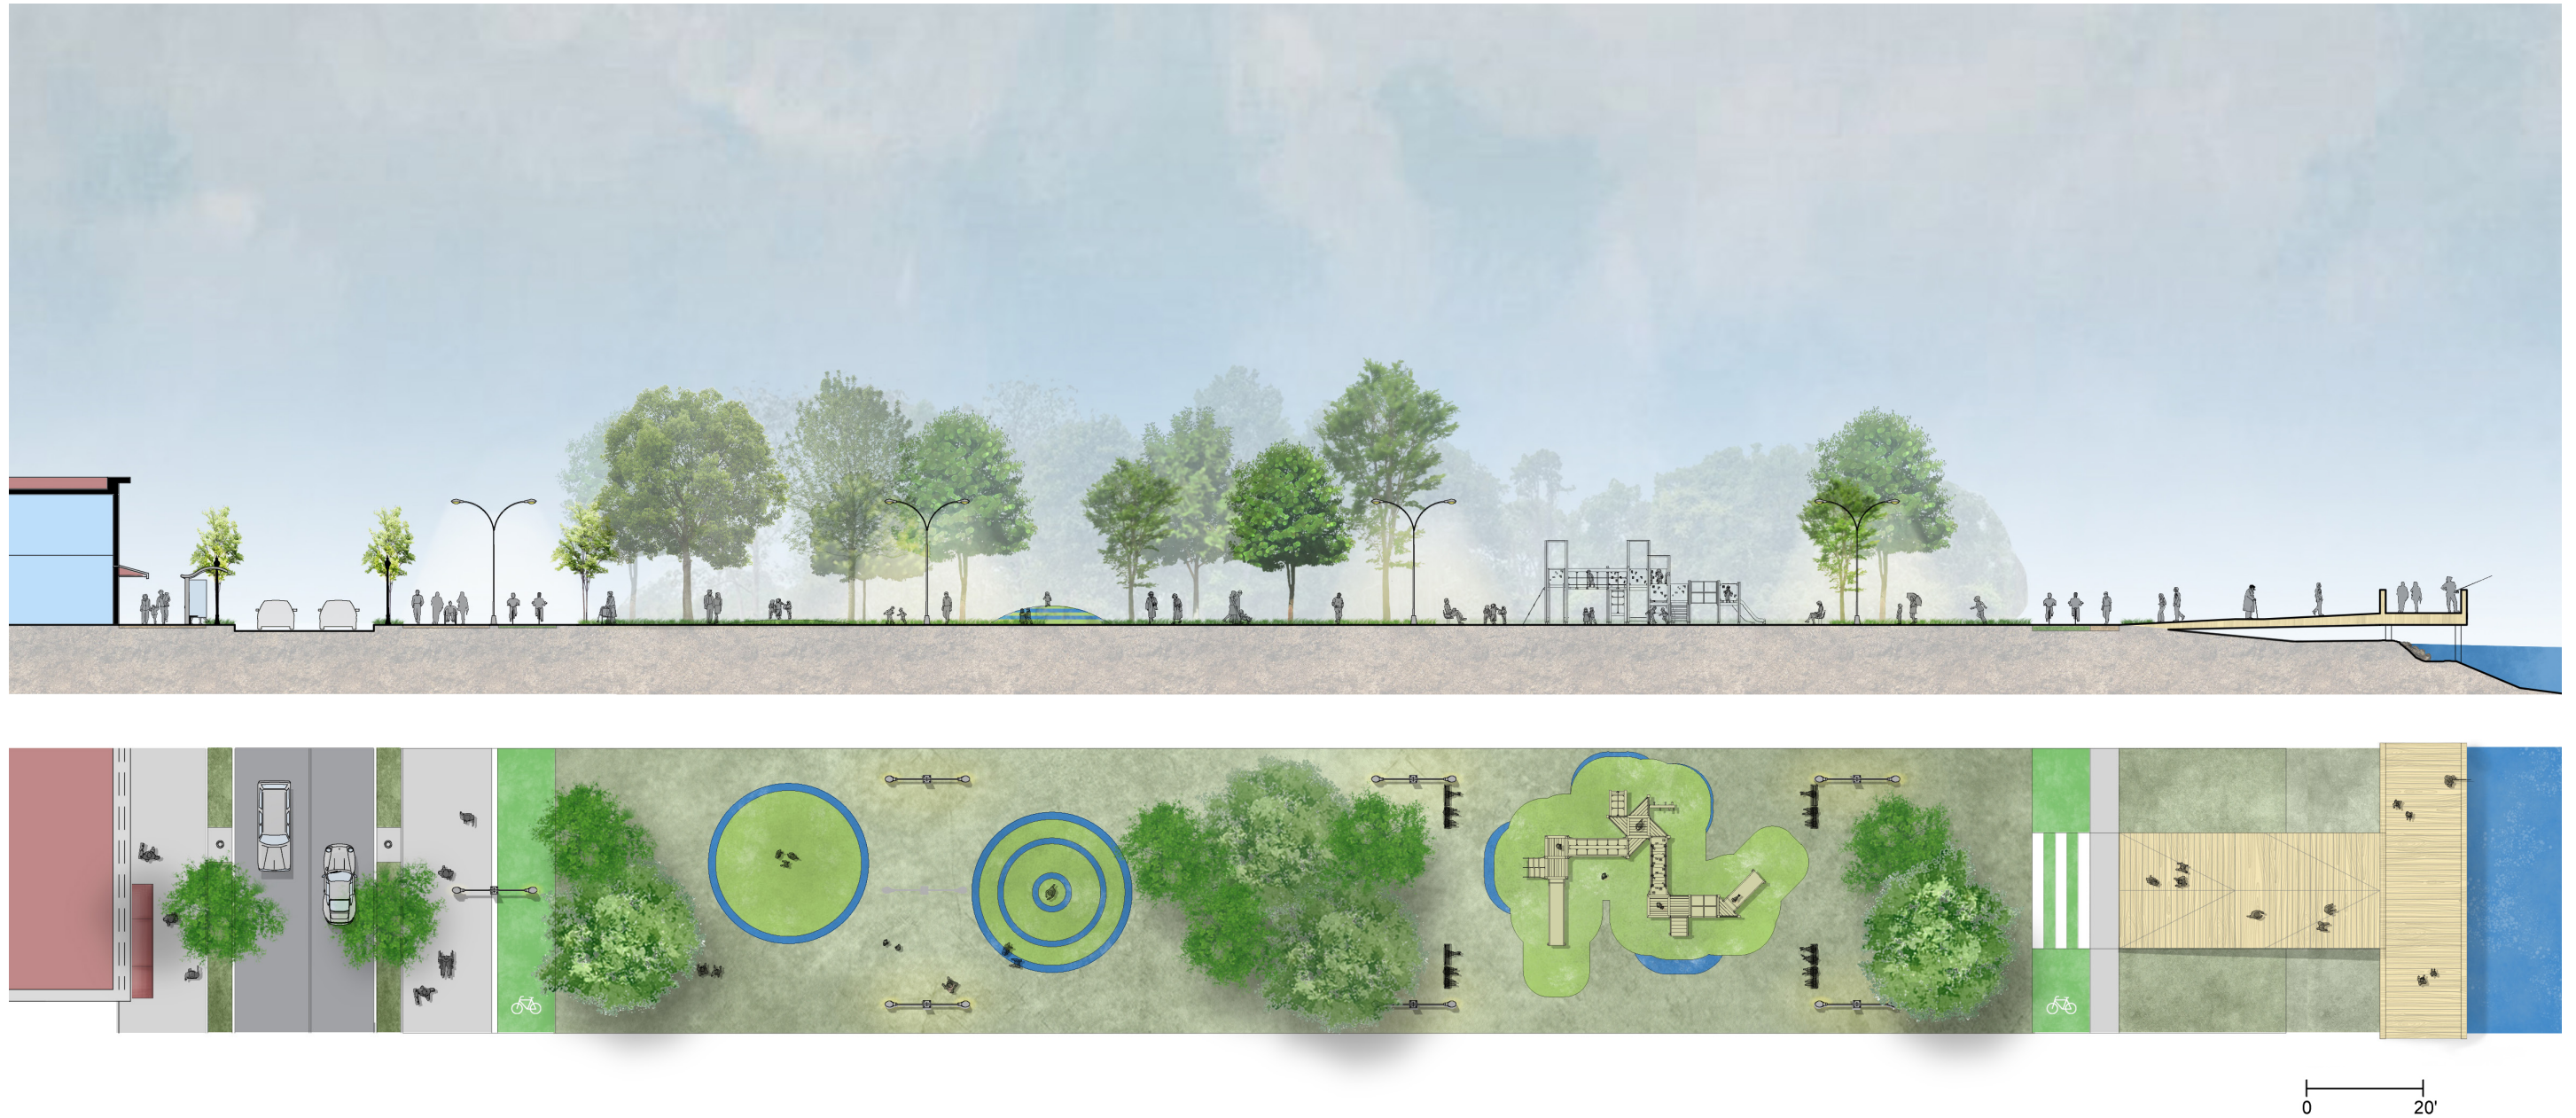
Conceptual Section of the southern Waterfront Park from the edge of East Avenue to a proposed Pier
